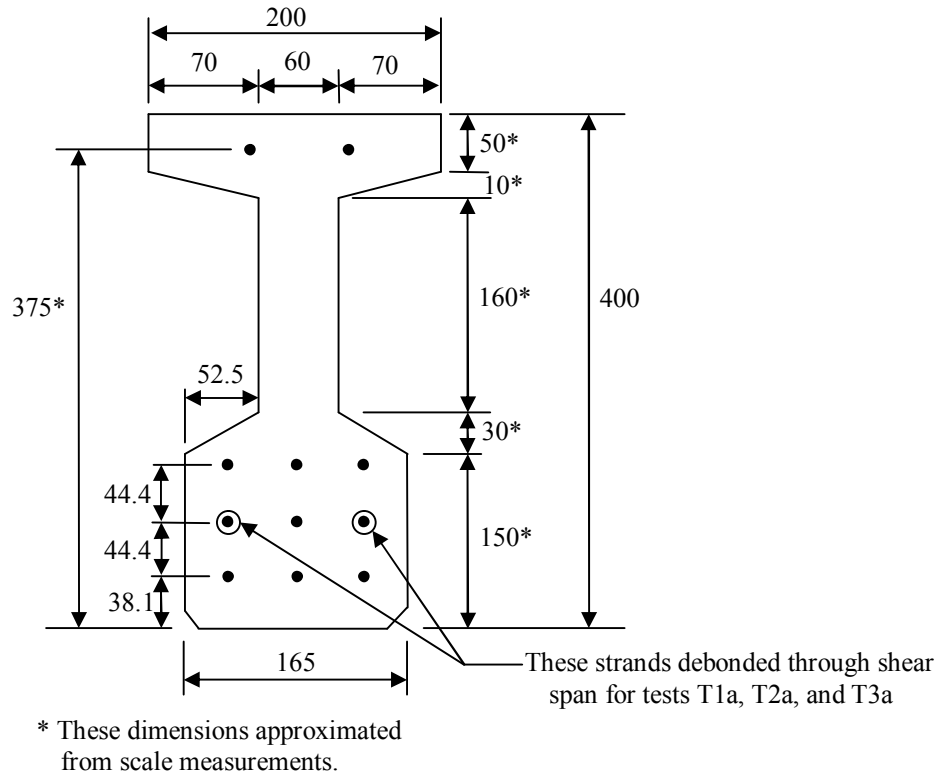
Cross-section of UHPC beam tested by Hegger and Bertram (2008). All prestressing strands were 0.5-in (13 mm) diameter 7-wire strands prestressed to 125kN (28.1 kips) each. All units in mm. Note: 1 in = 25.4mm.
